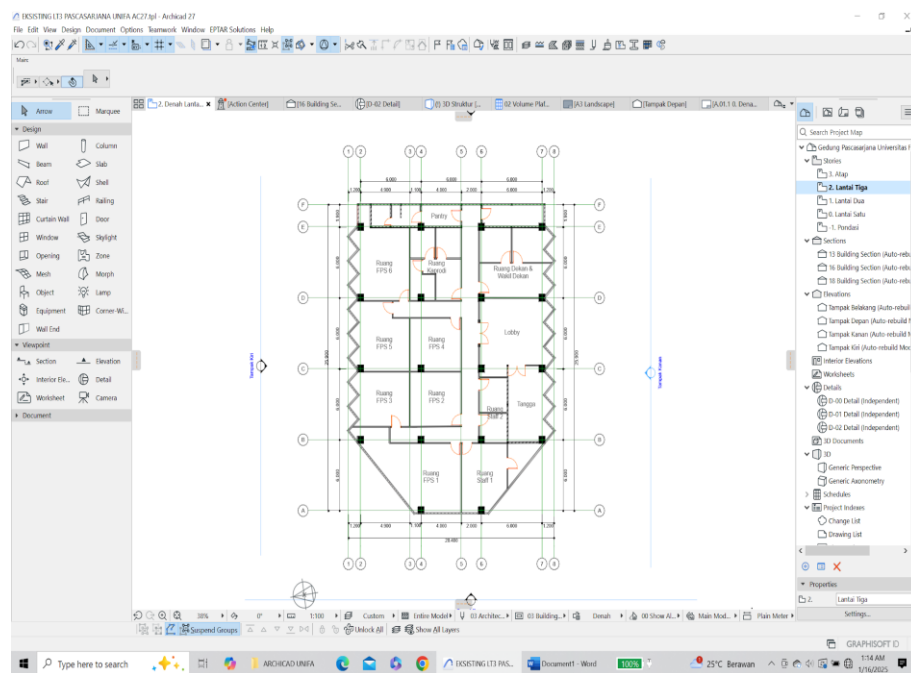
Primary Data of 2D Floor Plan of 3rd Floor of Fajar University Postgraduate Building
